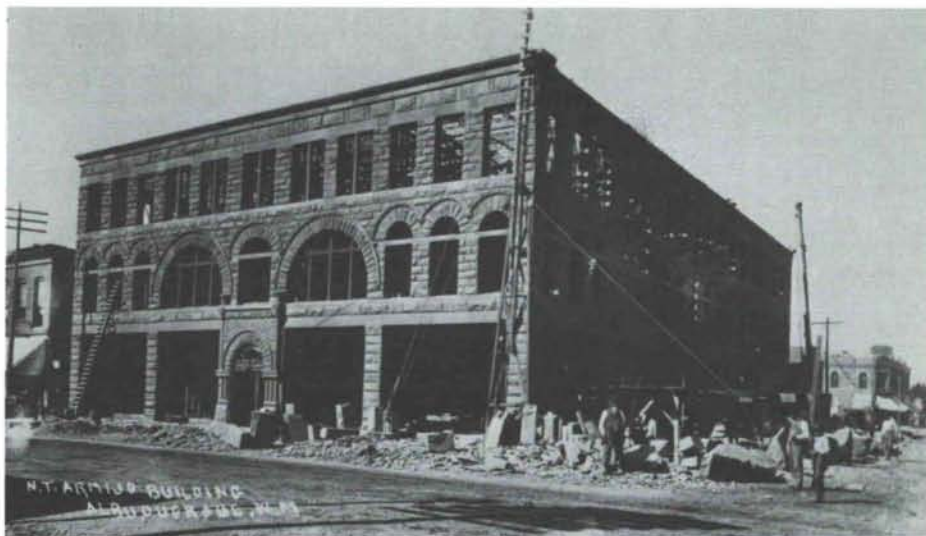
N. T. Armijo Business Block, northwest corner of Railroad Avenue (now Central Avenue) and Second Street, Albuquerque, New Mexico. Architect - Jesse M. Wheelock; Builder - Berardinelli & Palladino. Constructed 1892 - Demolished 1969. (Albuquerque Museum Photoarchives)
